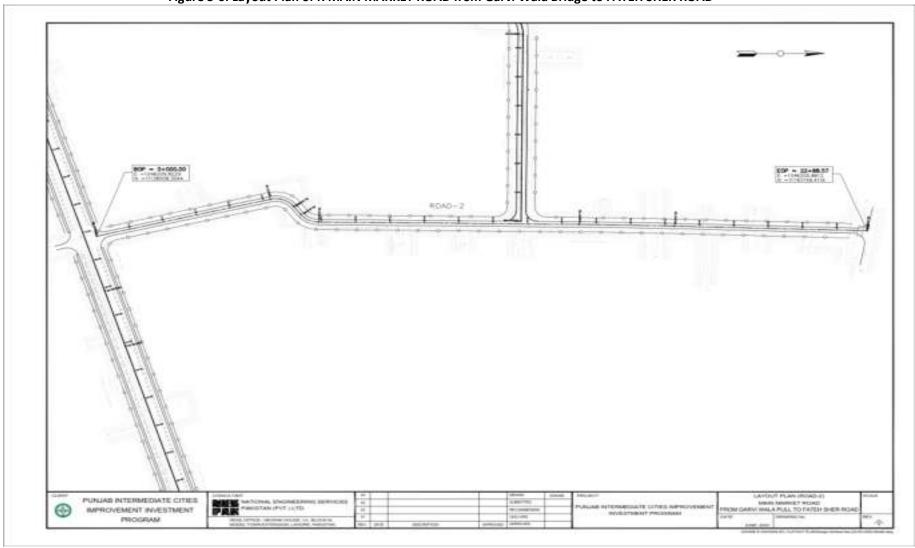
Layout Plan of R MAIN MARKET ROAD from Garvi Wala Bridge to FATEH SHER ROAD
